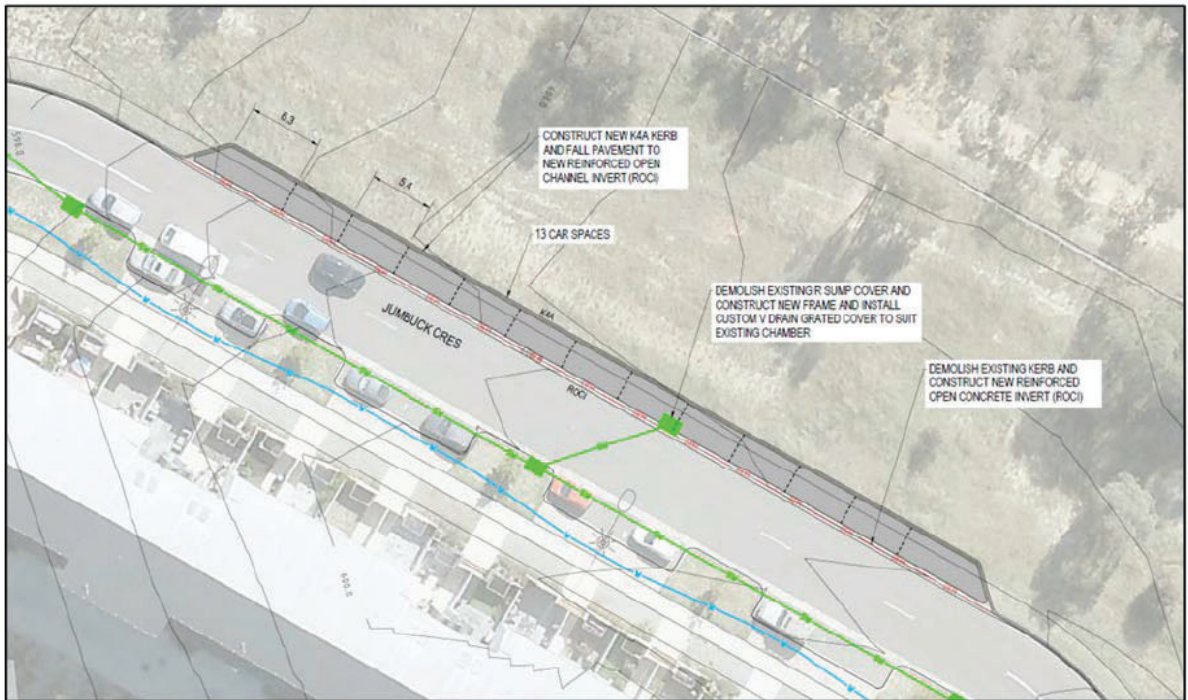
Extract Sketch Drawing - Jumbuck Crescent – Section 3 Proposed Car Park Layout
